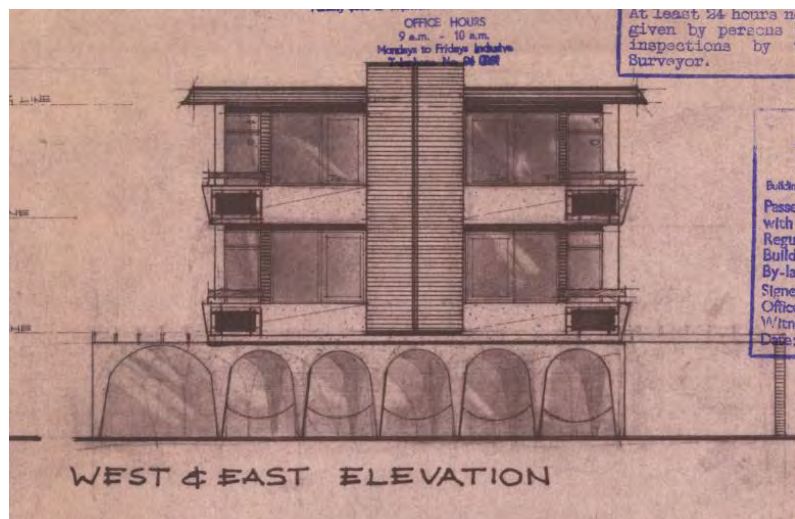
Extract from 'West and East elevation. Proposed 12 Flats at No. 1 Hartpury Ave, Elwood for Mr and Mrs Hall.' M. Feldhagen and Associates P.L. 20 August 1969. Source: St. Kilda City Council.
